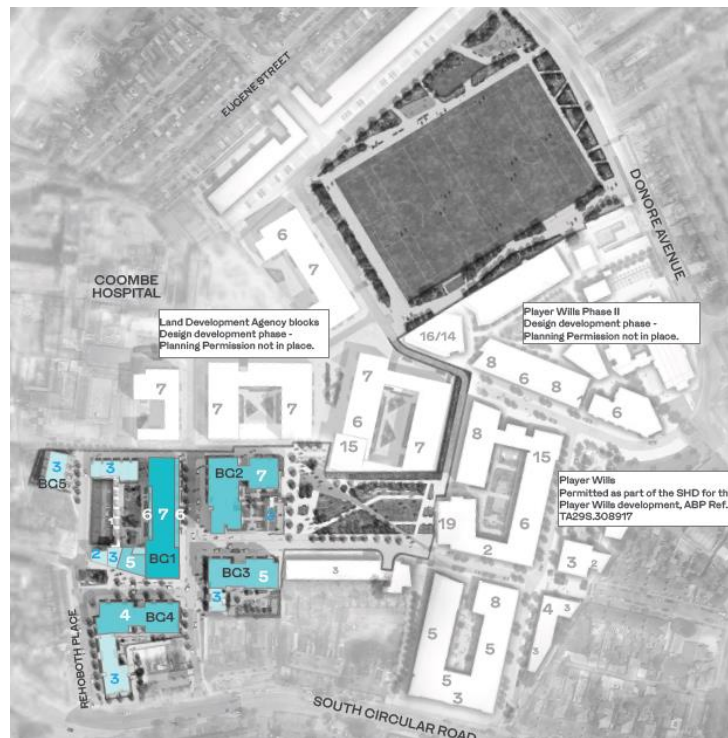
BAILEY GIBSON HEIGHT PLAN
